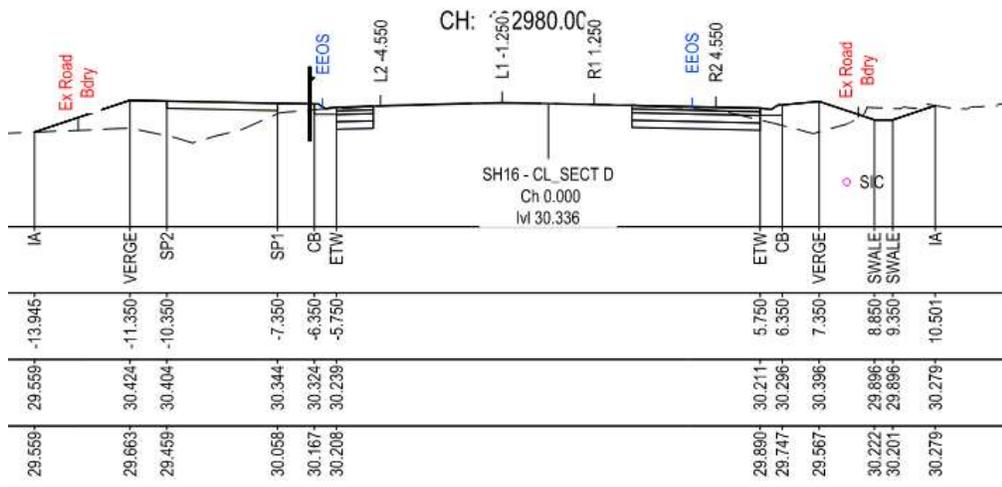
SH16 typical cross section proposed outside 464 SH16 (dashed line is existing ground)
